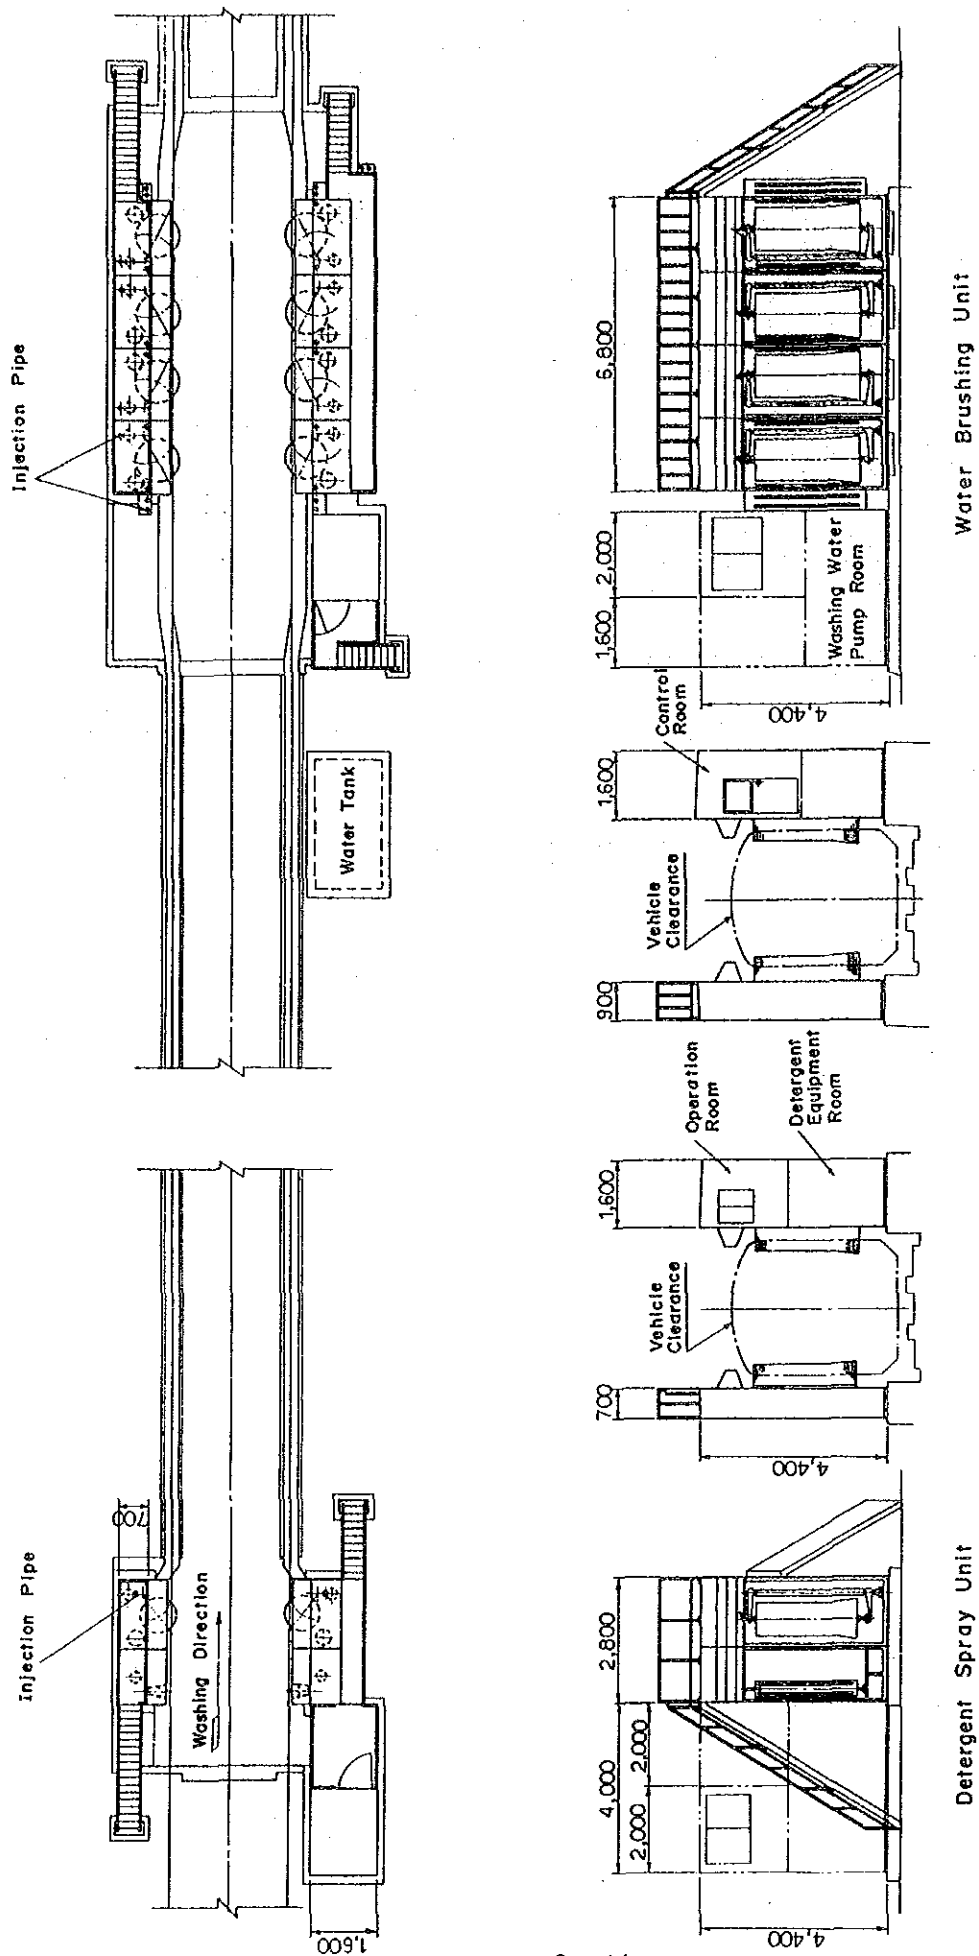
CAR WASHING COMPLEX ARRANGEMENT
